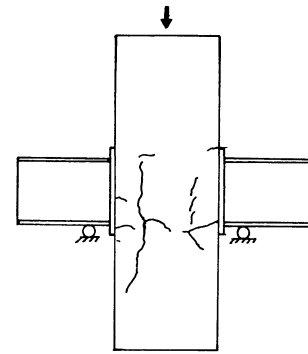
Sketch of the concrete cracking of specimen 1 of Group I at failure
